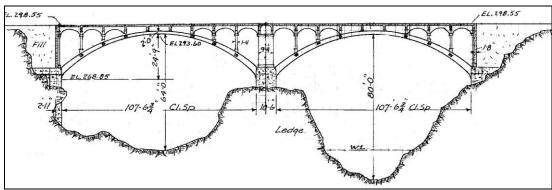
Vilas Bridge in elevation (NHDOT 1941).
